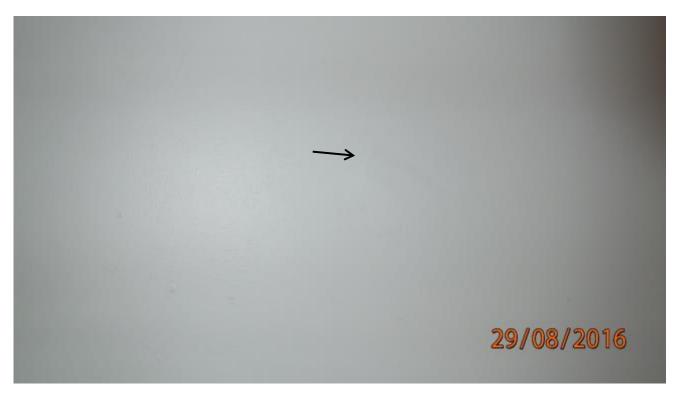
shows the general condition of the *common party / separation wall* in the sunroom.
